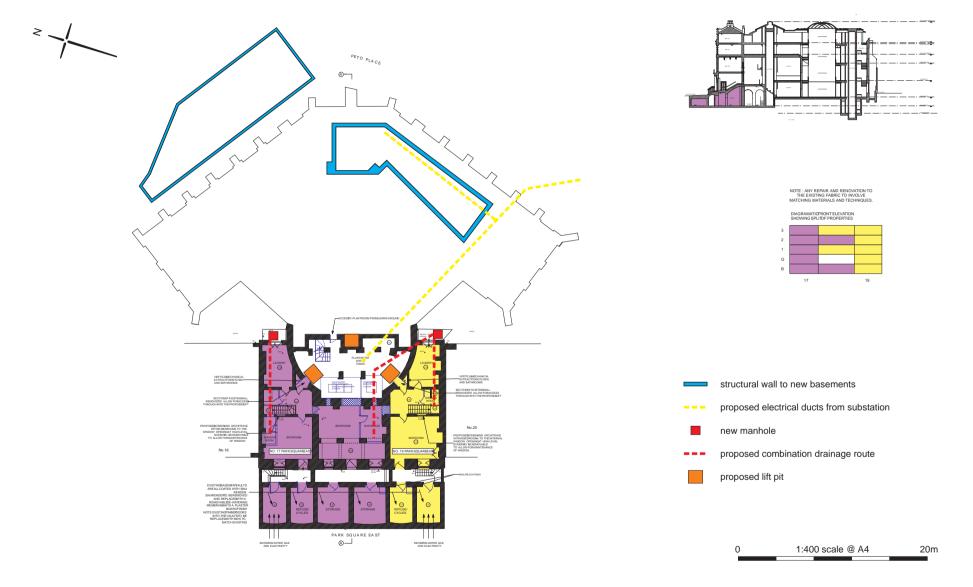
Plan of proposed basement level (HUB Architects and Designers Dwg. No. 1126-PL-01 Rev. K 12/07/2014)
